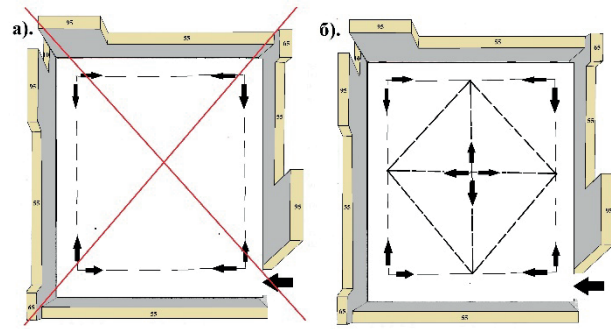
a). in the planning structure of the yard only fire lanes with sidewalks; b). in the planning structure of the courtyard, a developed sidewalk and path network
